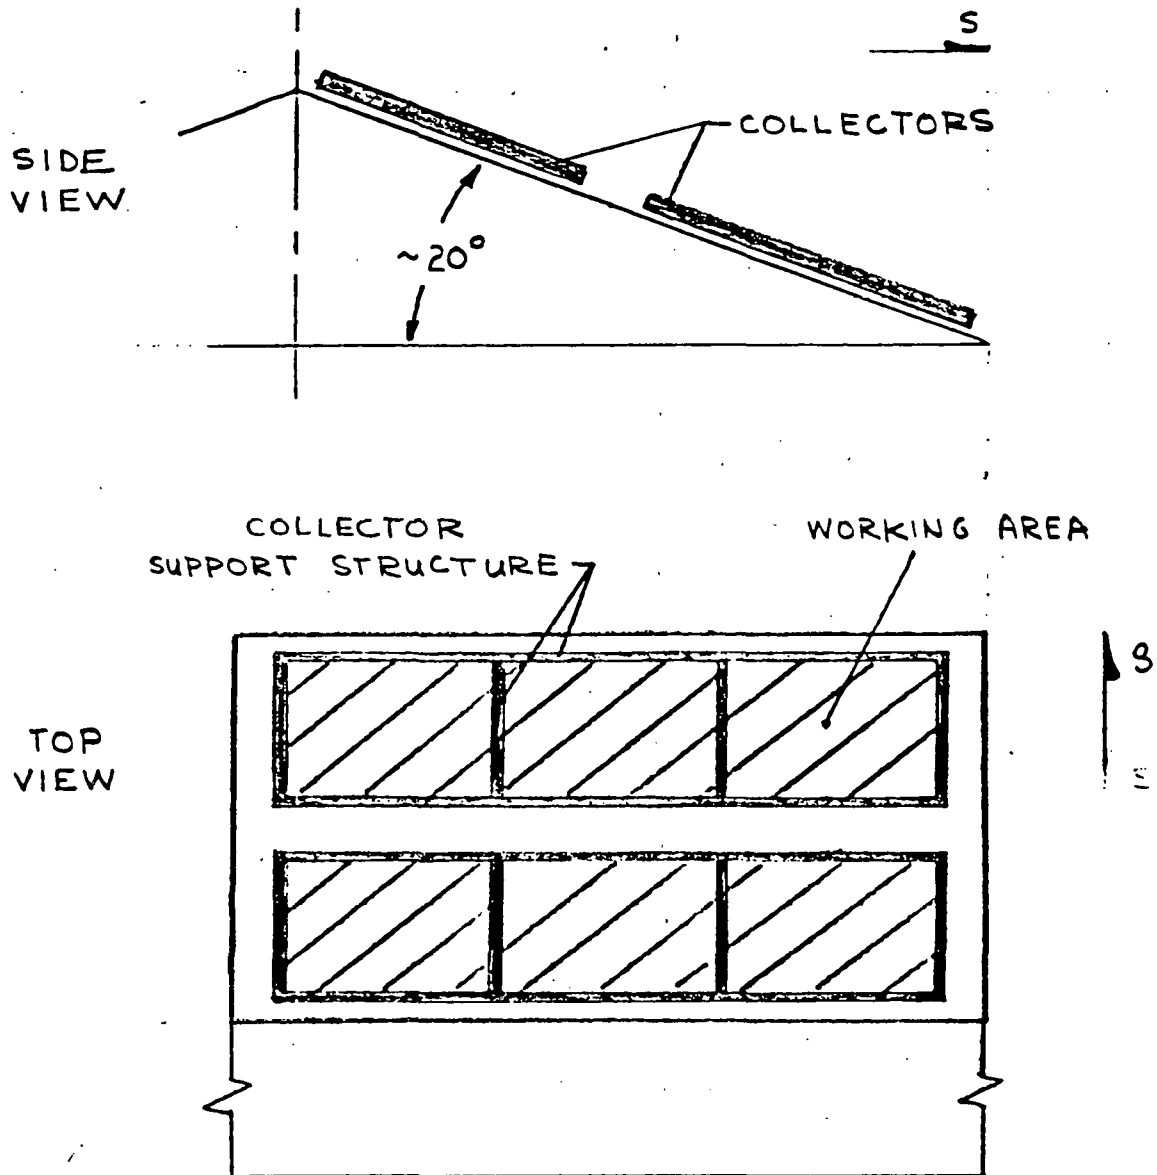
NON-TRACKING COLLECTORS MOUNTED ON A NORMALLY SLOPED ROOF
